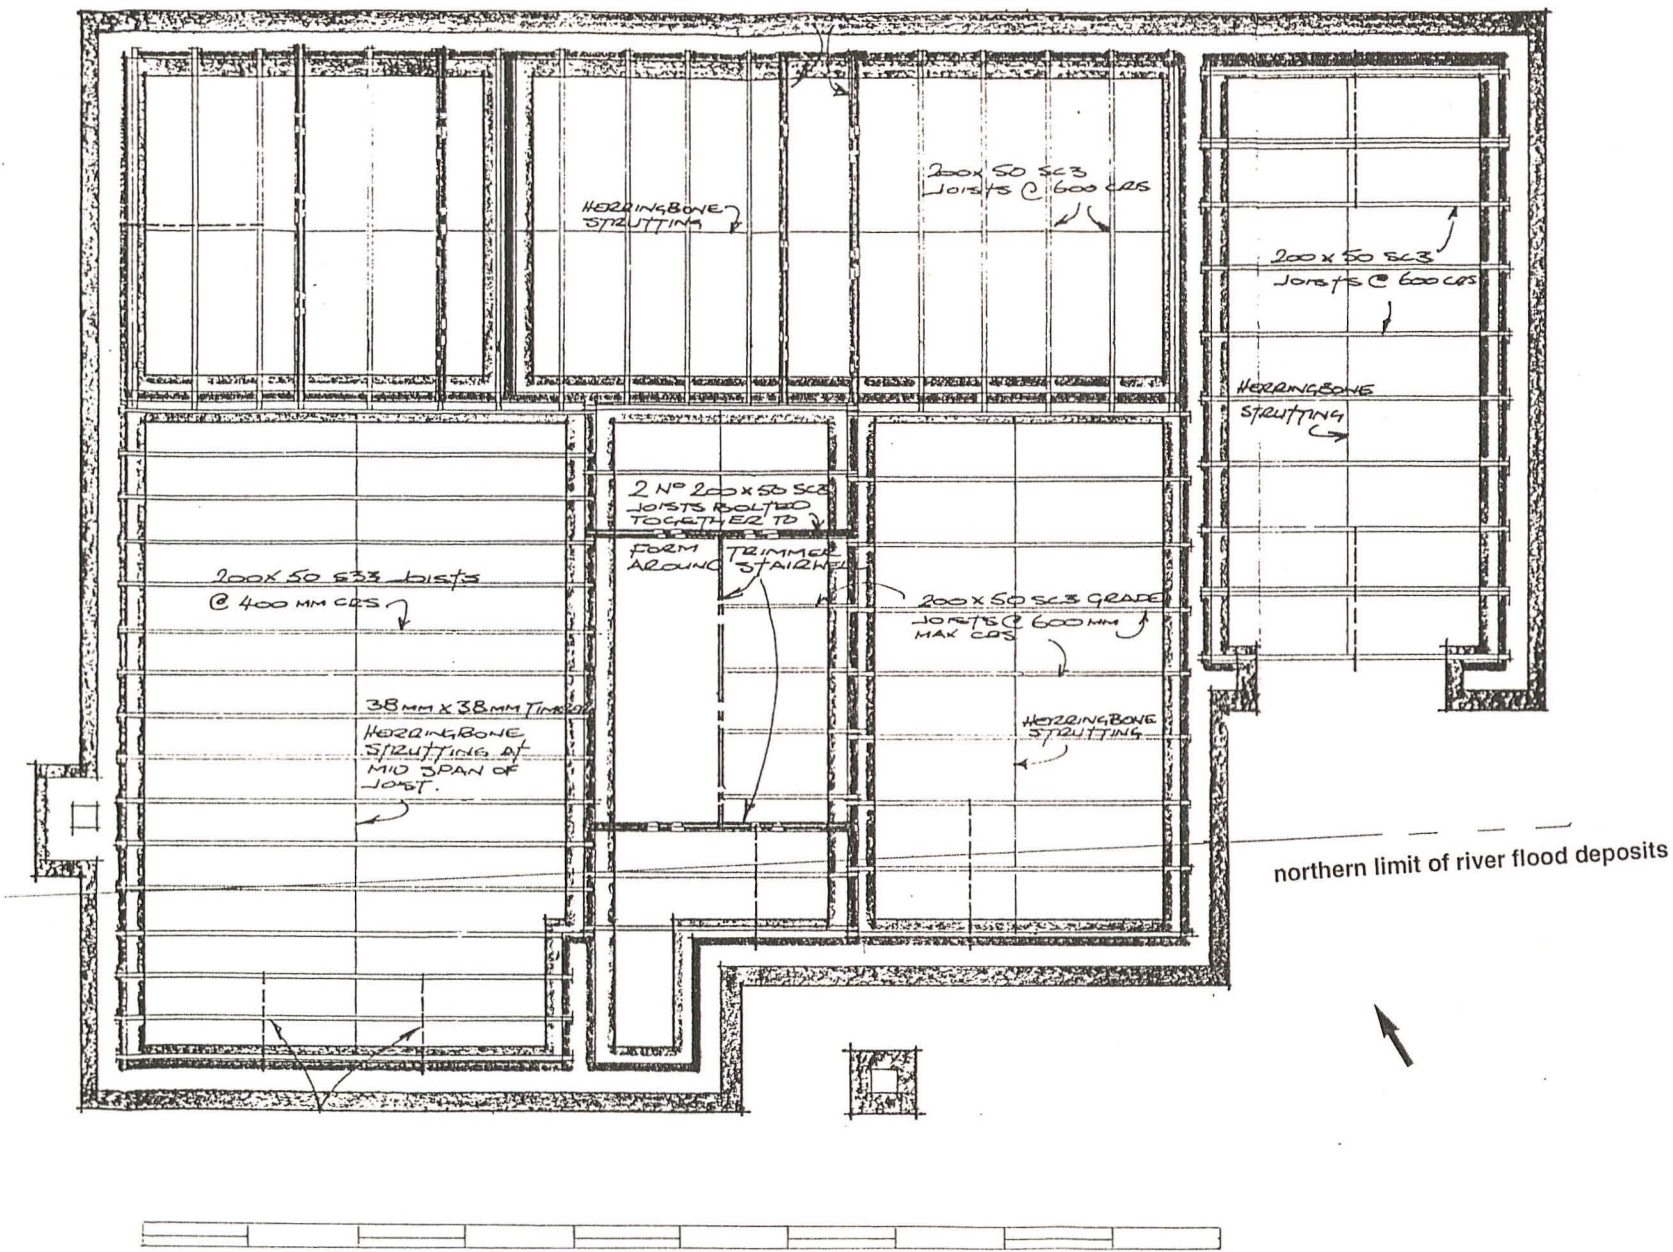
Trench plan showing edge of flood silts (reproduced from plans)
